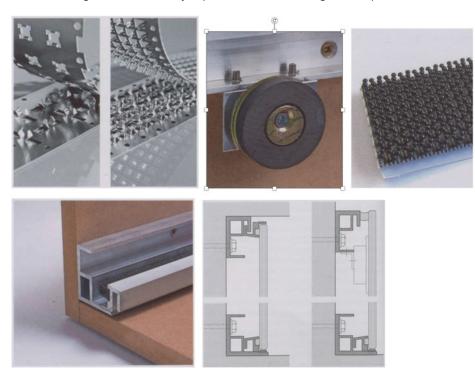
EXAMPLES OF CONNECTION SYSTEMS. @DETAIL
